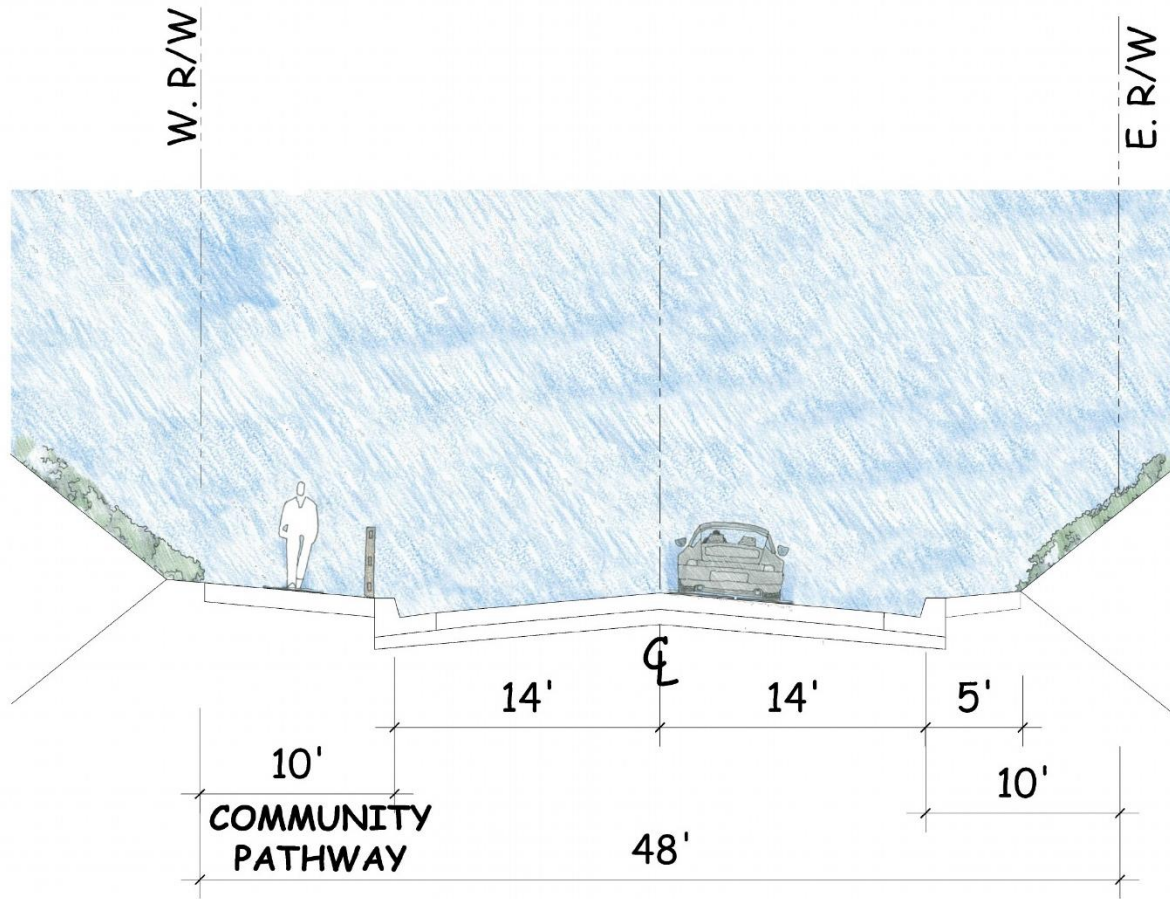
Section I 2a – Public Rural Residential Road (48' ROW)
